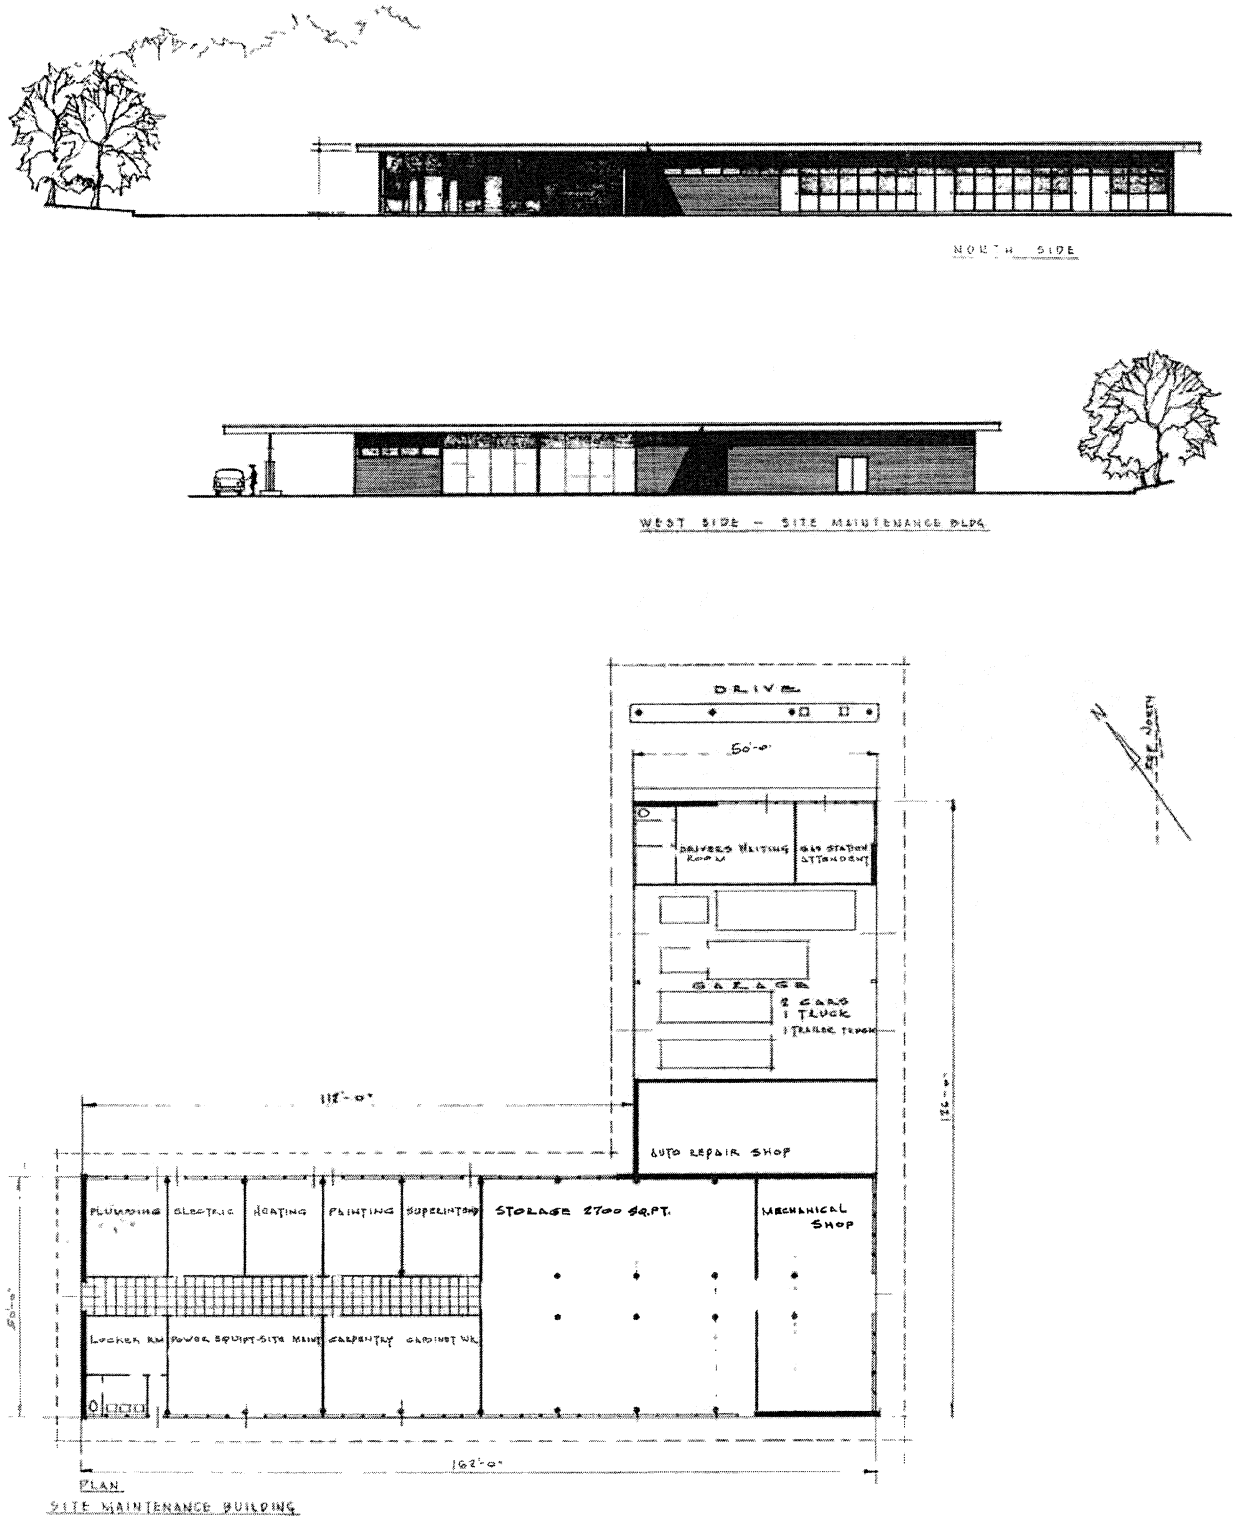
Plan and Elevation for the Proposed Site Maintenance Building as Prepared by Eggers & Higgins Architects of New York City.
